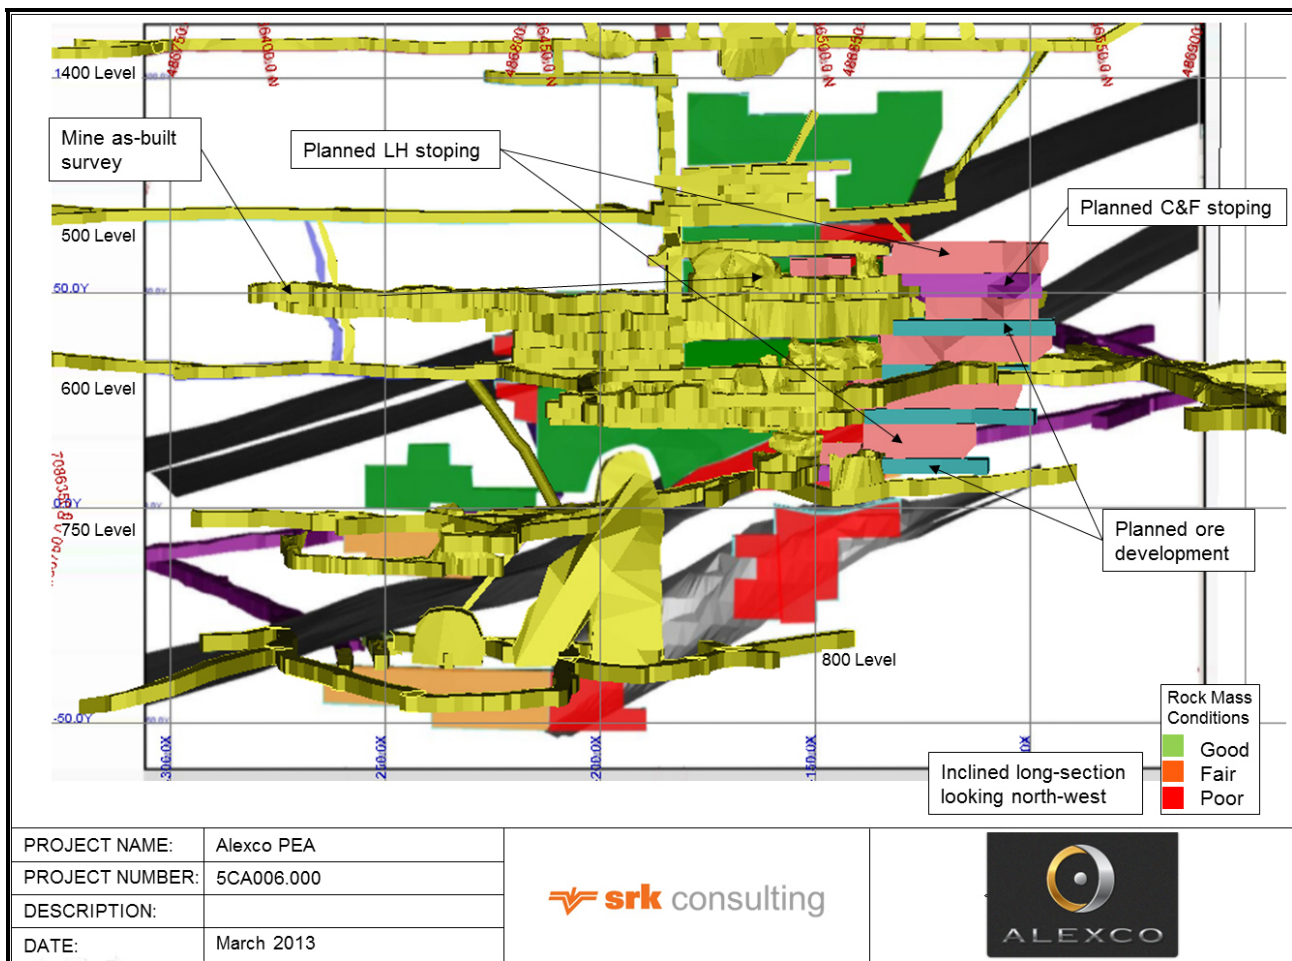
Previously Established Bellekeno 99 Zone Geotechnical Domains Shown Behind Planned Mining Zones - pink (SRK, 2013)
